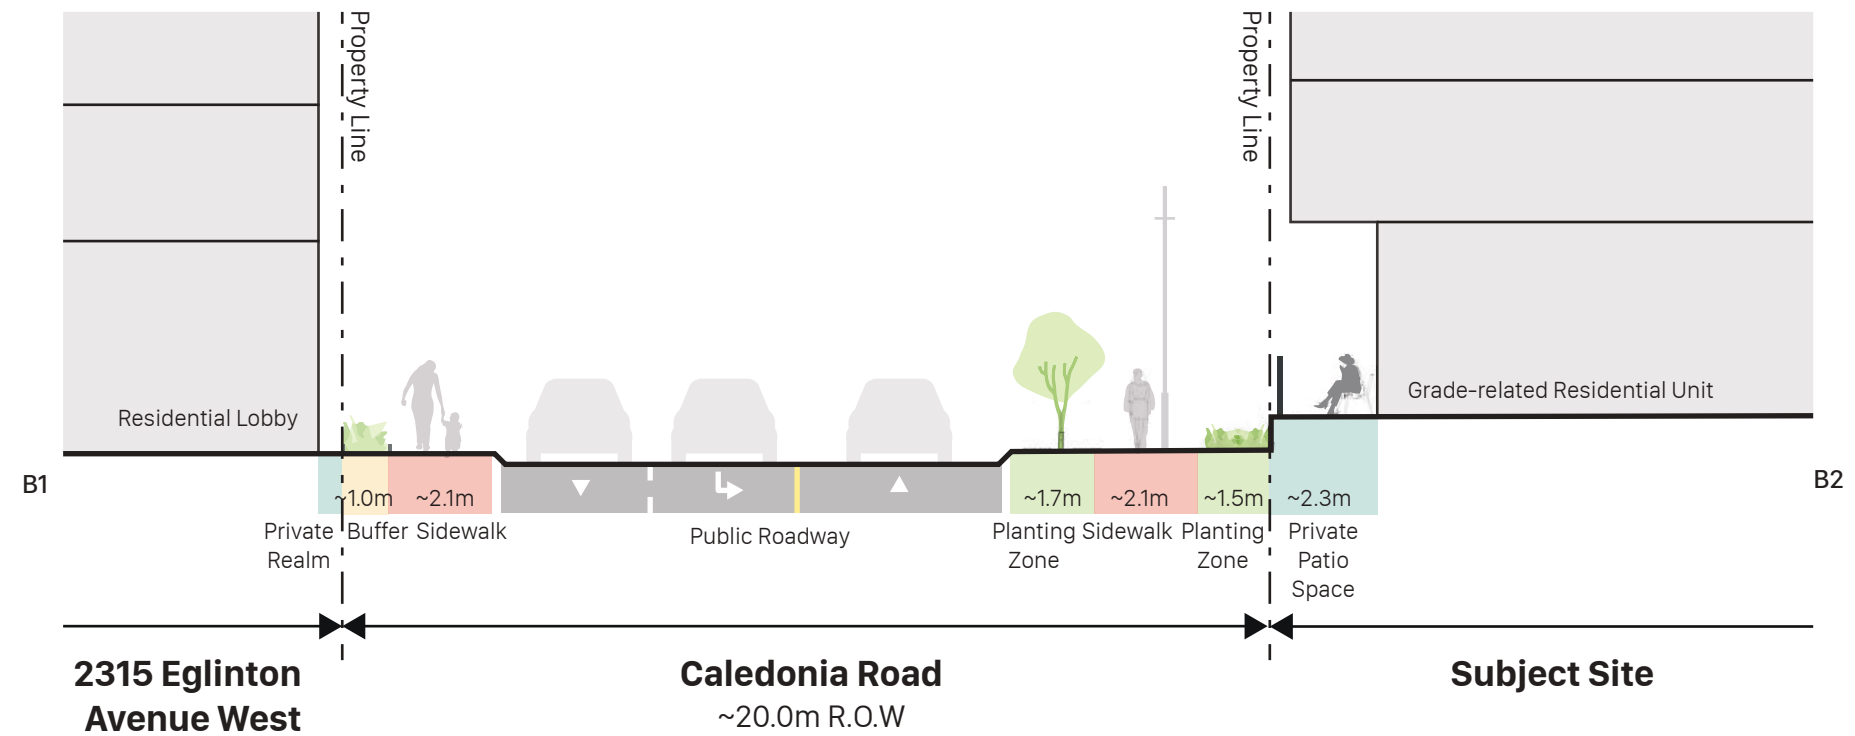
Section B1-B2 Caledonia Road (Proposed)
